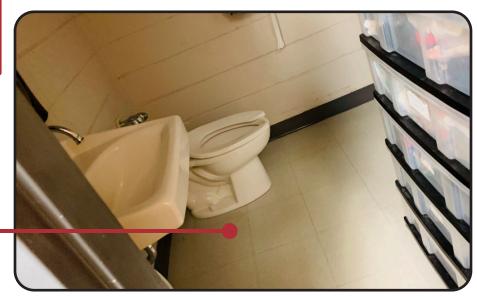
TYPICAL SINGLE-USER TOILET ROOM
